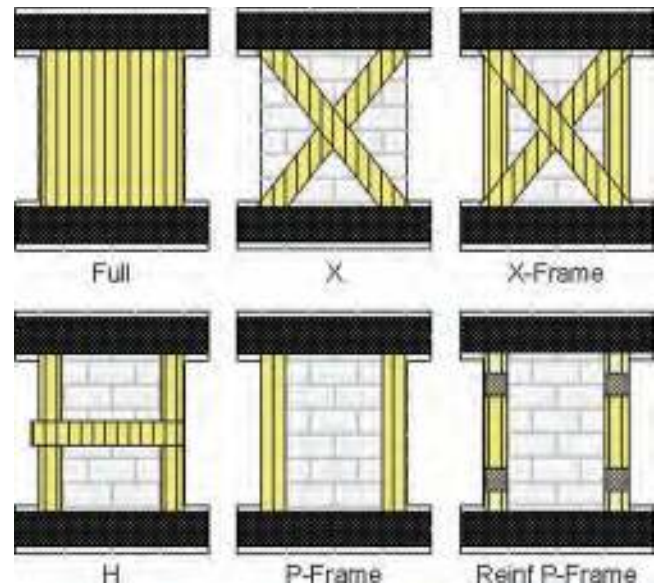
Reinforcement configuration for walls (Aldea et al. 2007).
